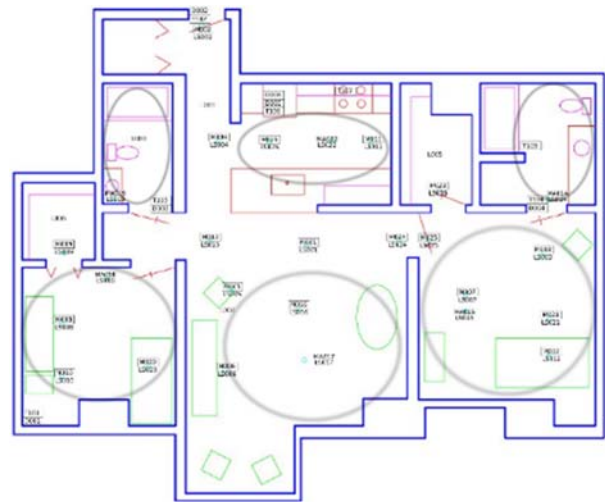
An example CASAS smart home floor plan and sensor layout. The example layout has a bedroom, a kitchen, a dining area, a living area, and two bathrooms.
